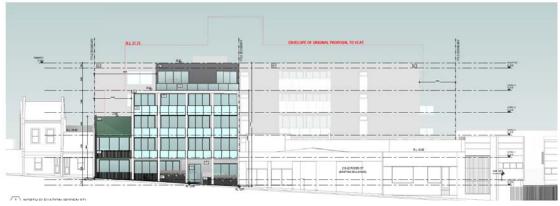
Roden Street Elevation. Red line showing extent of refused building envelop (Source: Point Architects Pty Ltd)
